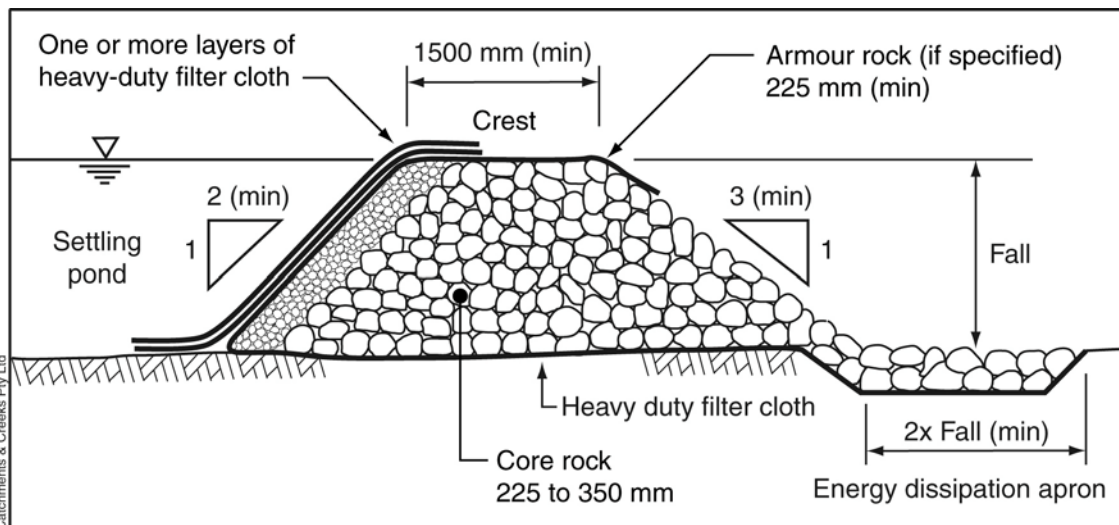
Typical profile of *Rock Filter Dam* outlet structure with geotextile filter
